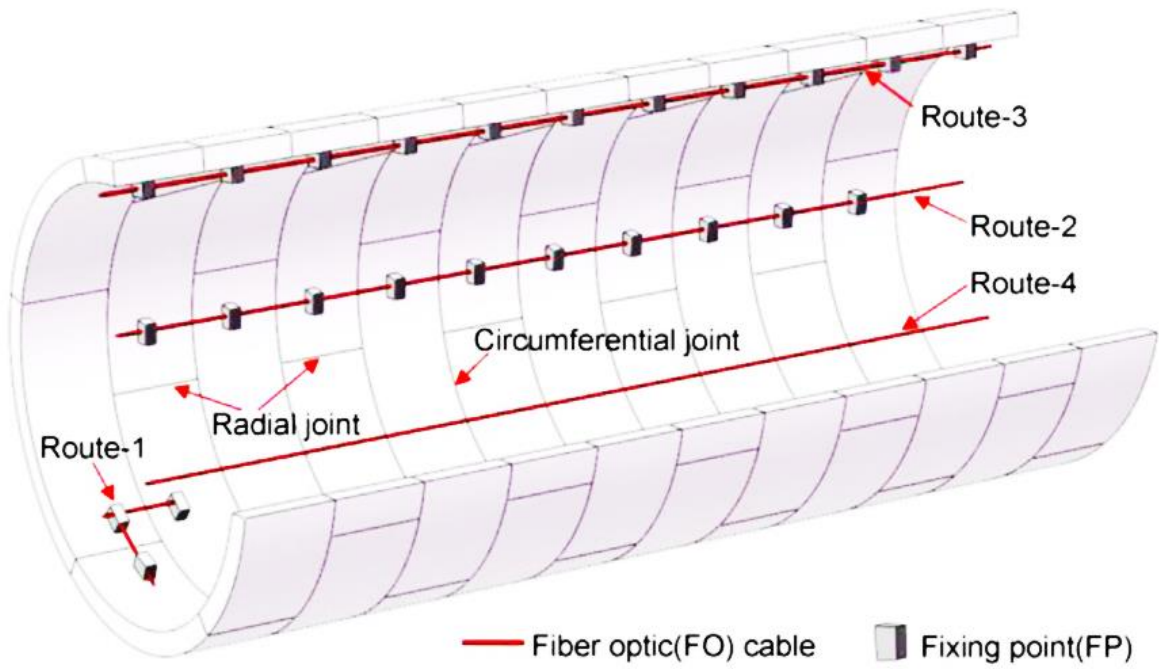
Typical installation fibre optics installation arrangements fur tunnels (Zhang et al, 2024)
